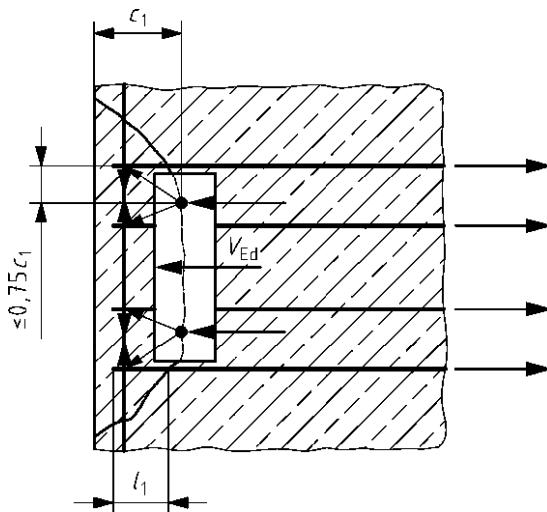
Surface reinforcement to take up shear forces with simplified strut and tie model to design edge reinforcement
